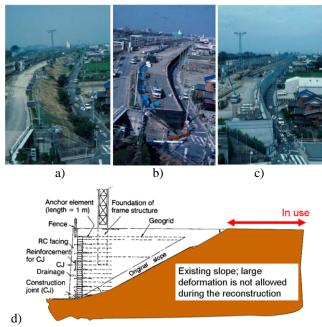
a) Before; b) during; and c) after reconstruction of embankment slope to a GRS RW having a FHR facing; and d) typical cross-section, a yard for bullet trains (Shinkan-Sen) in Nagoya; average wall height= 5 m; total length= 930 m; & construction period= 1990 -1991 (Tatsuoka et al., 1997).
